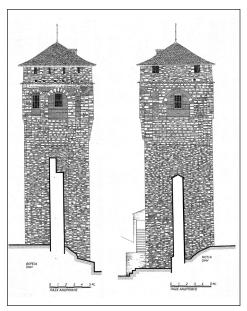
Tower of St Sava. North and south elevations (P. Androudis)
